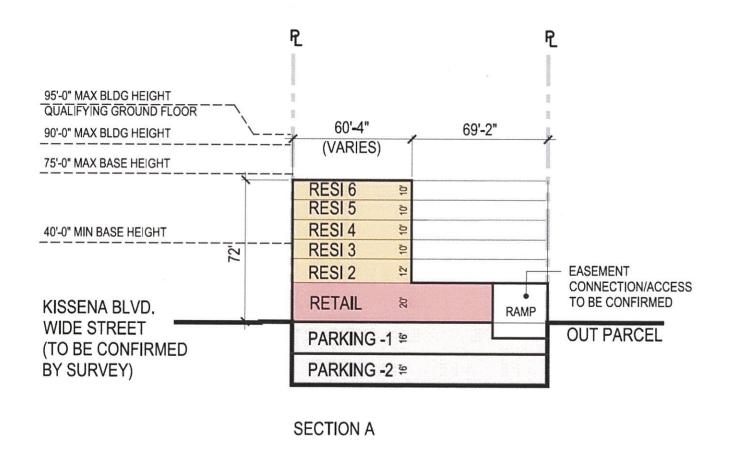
Sectional Plans - Proposed Development Site "B" (Lot 32)
